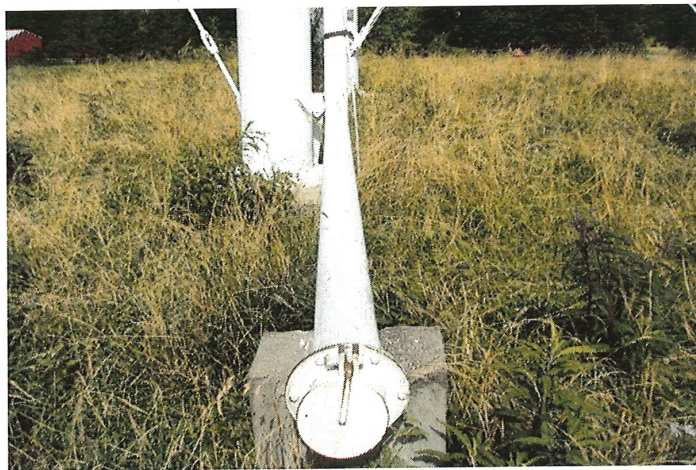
" column anchor bolts. Each leg has 2 anchor bolts. Minor rust is visible along the nut to column flange interface.
